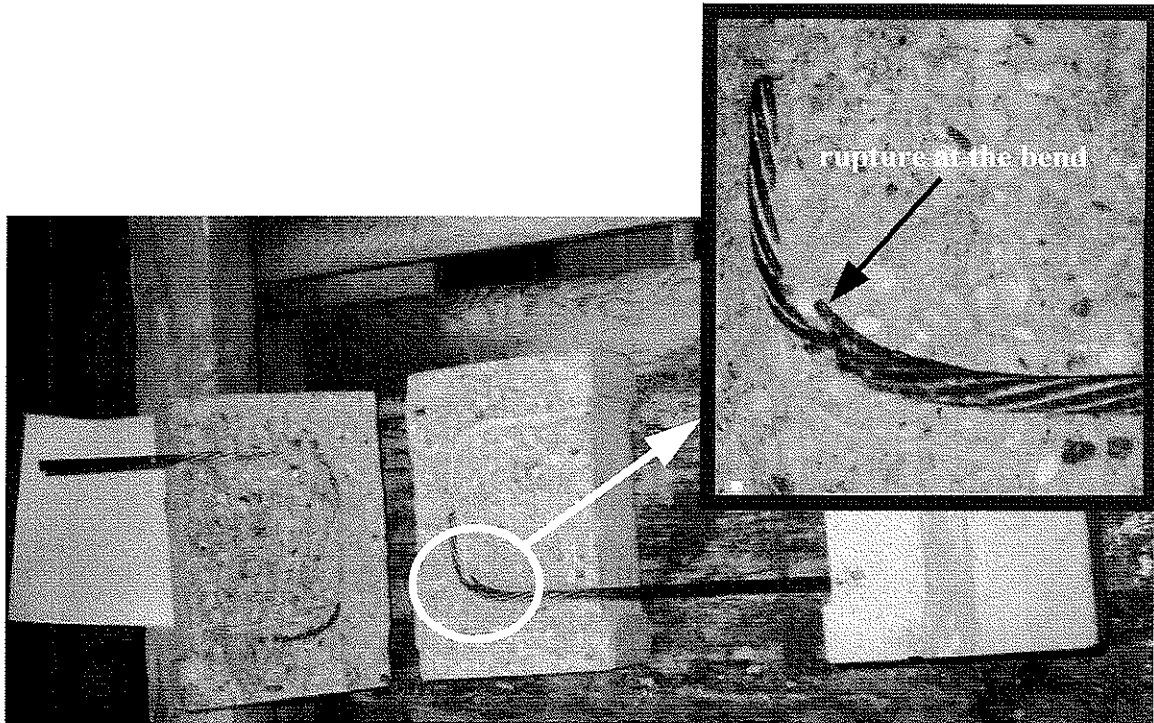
Failure at the bend - CFRP CFCC stirrups
